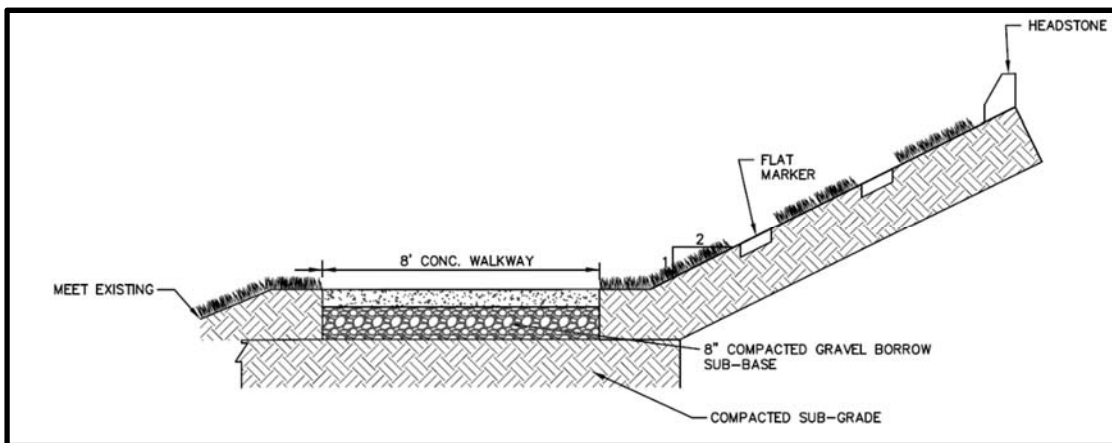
Area 12 Expansion Cross Section B-B
